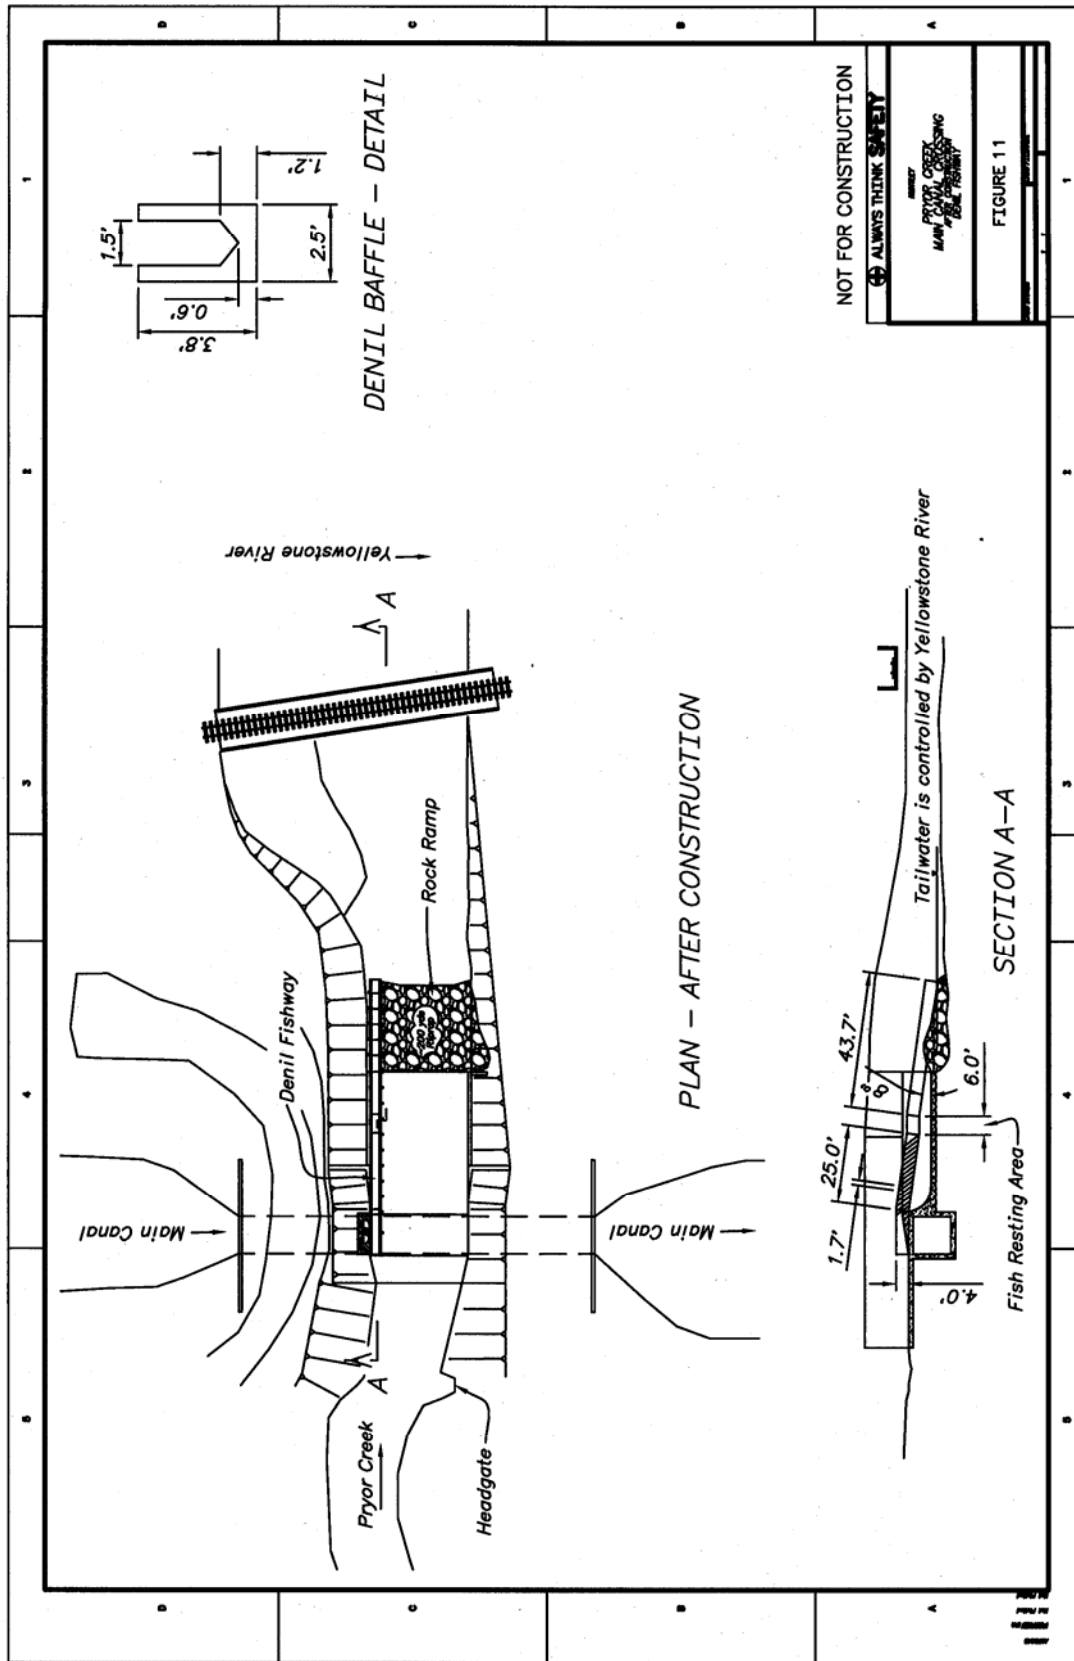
Plan and sections of a Denil Fishway option, Huntley Canal crossing at Pryor Creek
